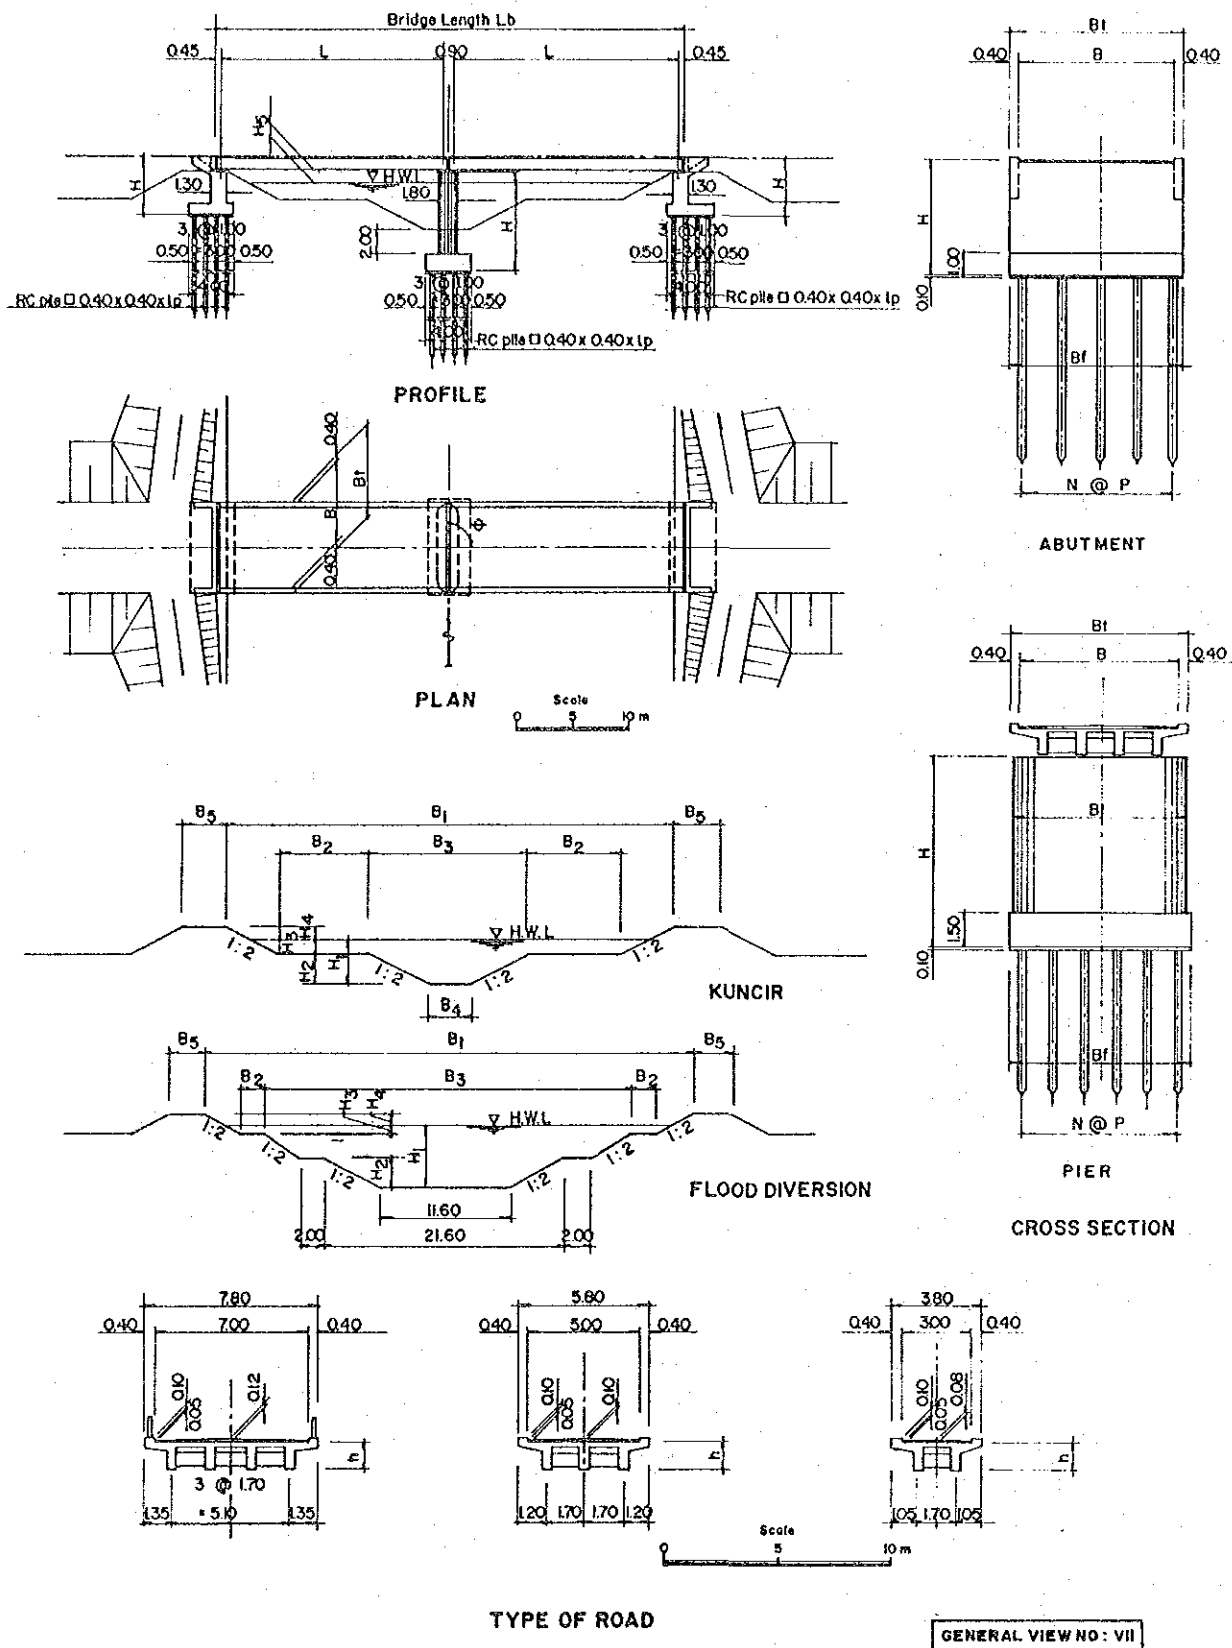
STANDARD DESIGN OF BRIDGE (2/4)
